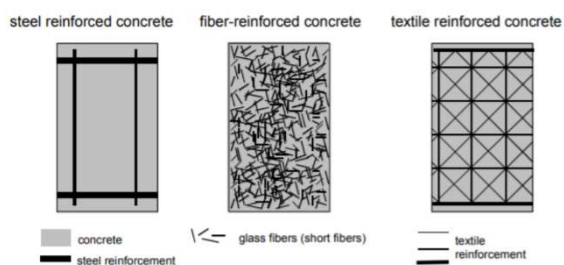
Concrete reinforcement systems: a) Conventional reinforced concrete; b) Concrete fiber reinforces; c) Textile reinforced concrete. Source: [5].
